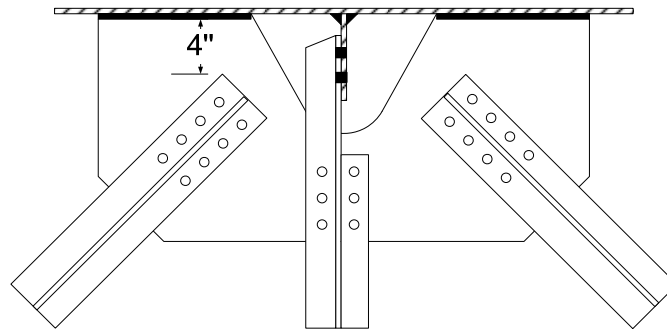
Lateral Bracing Member Bolted to the Transverse Stiffener
